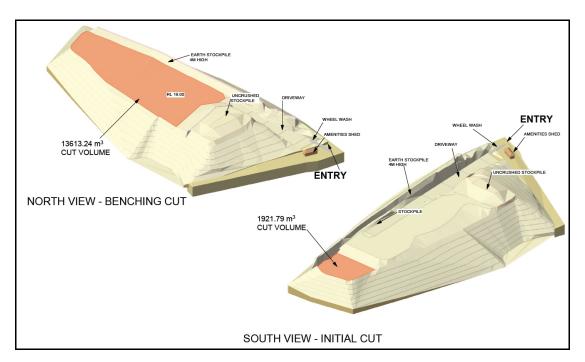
Extract from the 3D model of Stage 1 of the proposed development. Full details are provided on Drawing No.12, Issue E of the plans of the proposed development at Appendix 9.
